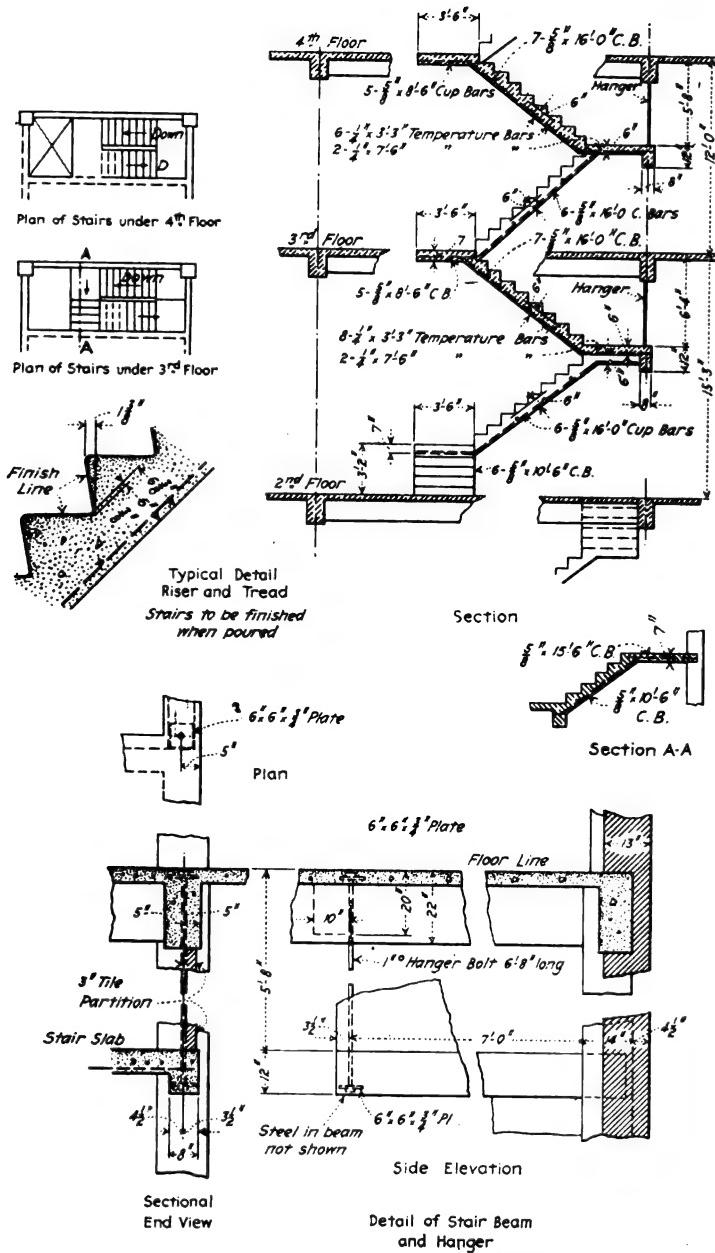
Stair details. The Bobbs-Merrill building, Indianapolis, Ind.
